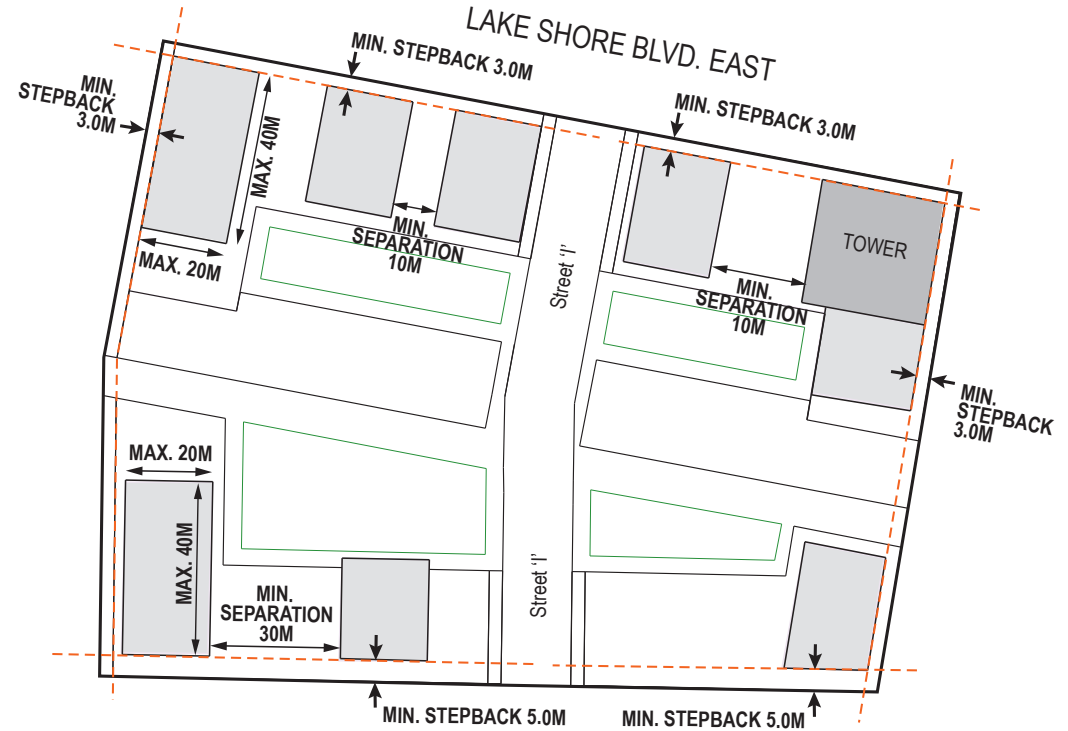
Penthouse structure parameters- dimensions, step backs, and separation distance. \*For penthouse structures adjacent to Point Towers, refer to Fig. 5.2.2b
